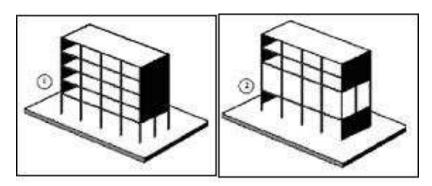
Example of soft story in building Source: (Murty, 2005)
